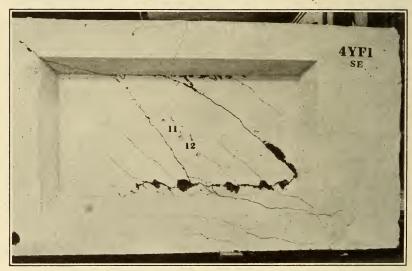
Failure of beam 4YF1 by horizontal shear combined with diagonal tension
